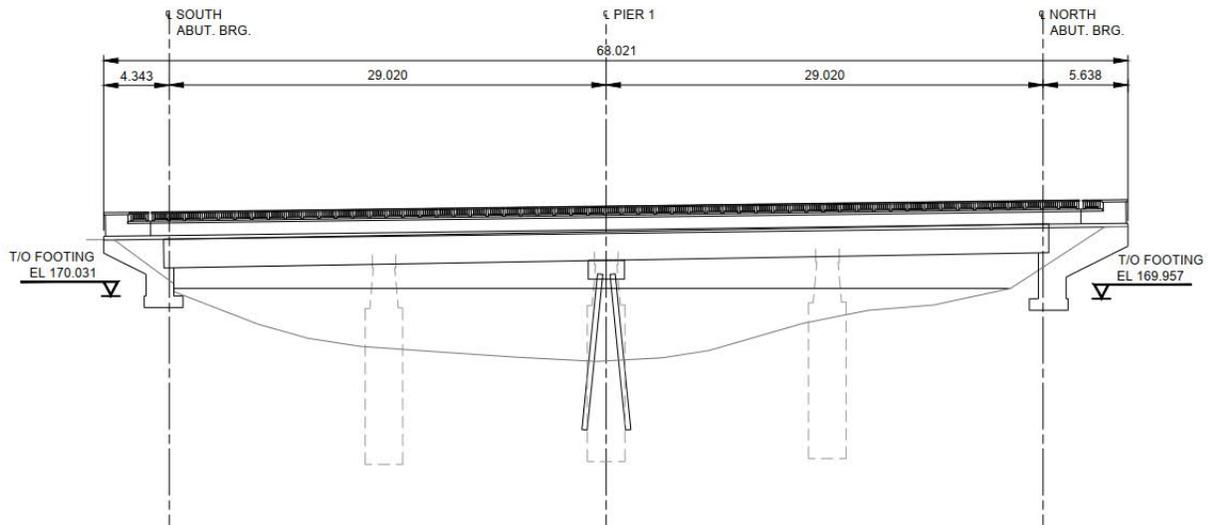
Proposed Elevation for Alternative Design Concept 2
